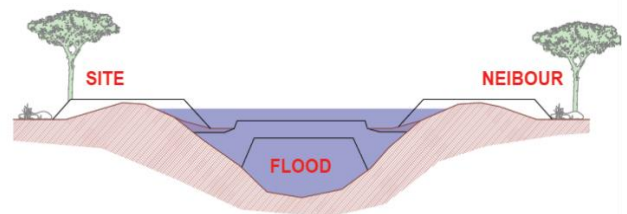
Bridge-level flood impact and drainage constraint observations Source: Field survey, (2025)
